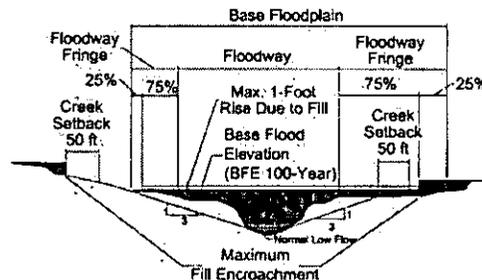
Floodway Fringe Encroachment and Creek Setback Schematic
